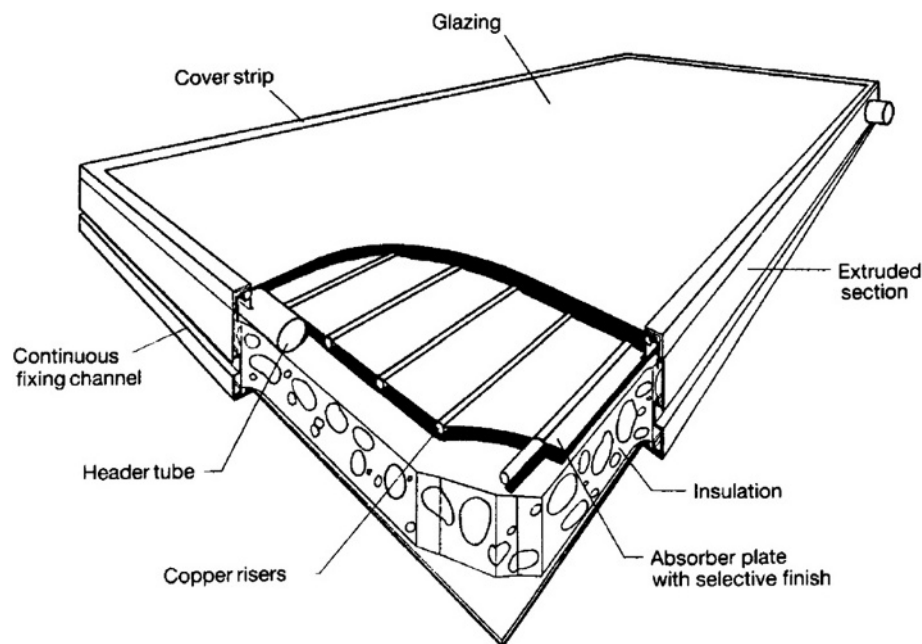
Pictorial view of a flat-plate collector.
